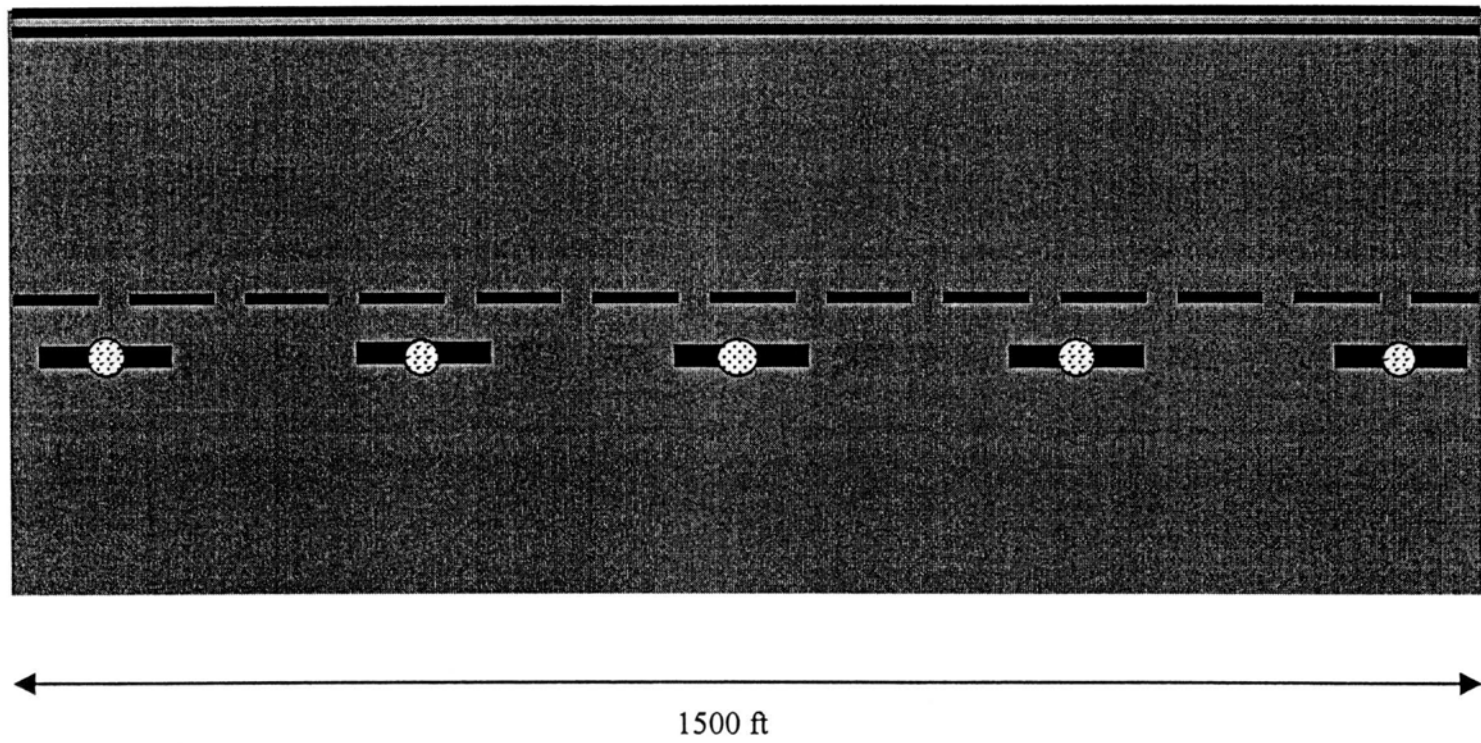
Typical Layout of a Pavement Test Section for Field Skid Test
